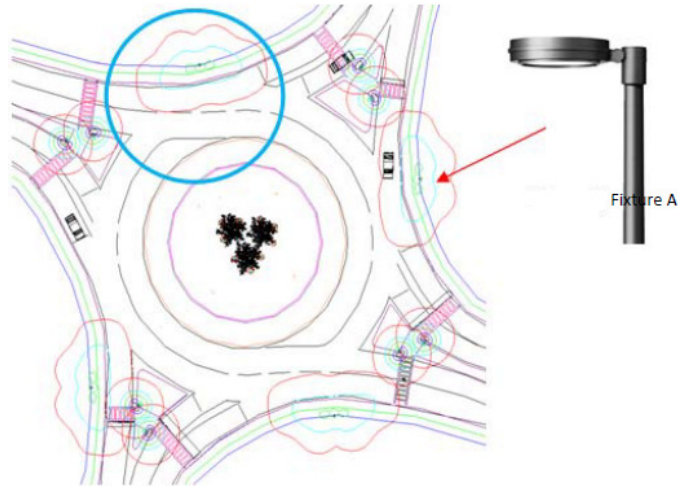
Top view drawing of the roundabout with the four 30W LED area fixtures.
